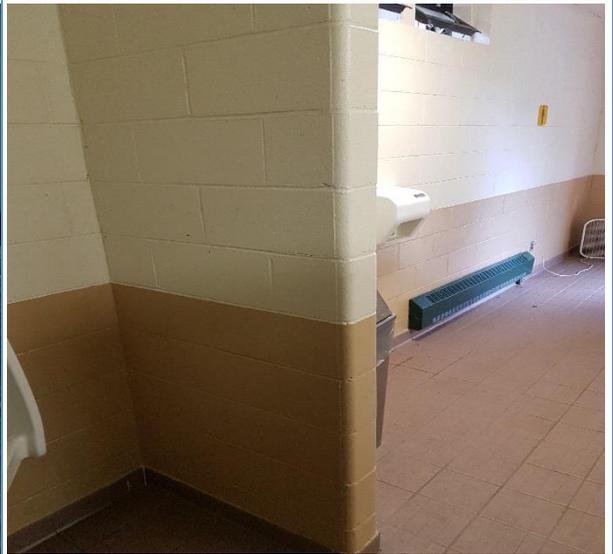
View of the non-asbestos concrete block mortar from the interior walls of the Washroom Building.
